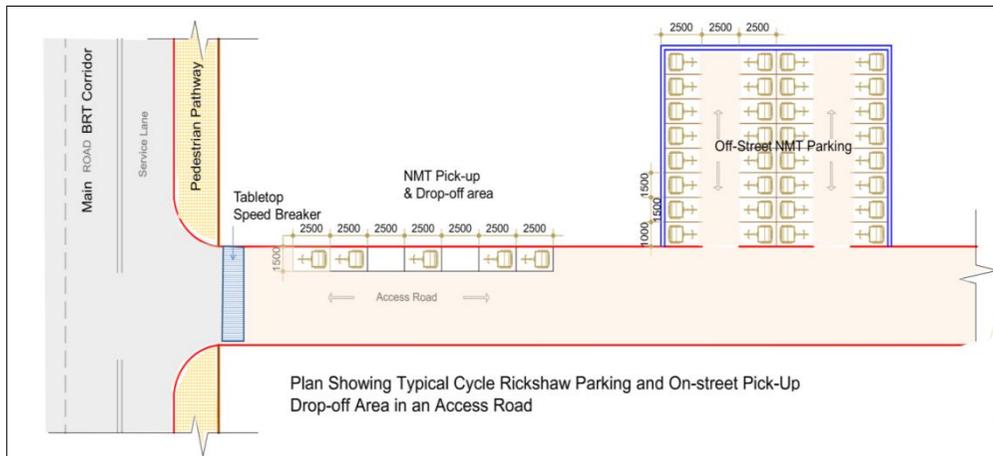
Accessibility Improvements for Access Roads (<5 M Wide)
